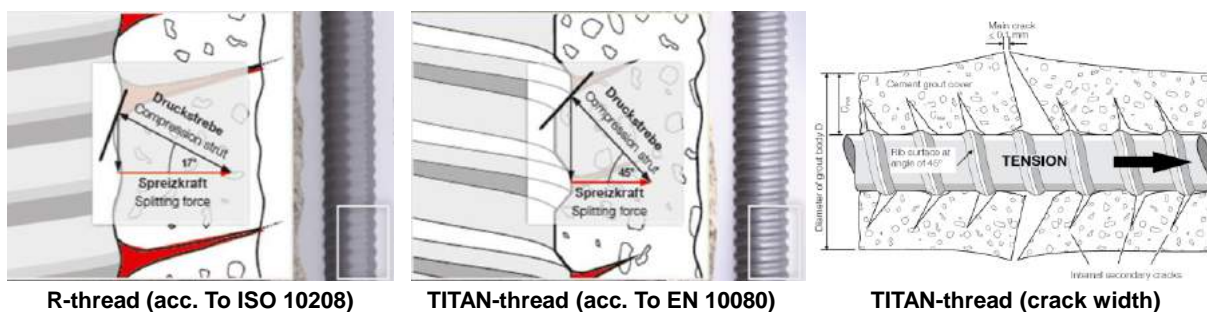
Cracking pattern and splitting forces on R-threaded hollow bars (left), on TITAN hollow bars (middle) and crack width limitation in the grouted body (right) [7]
